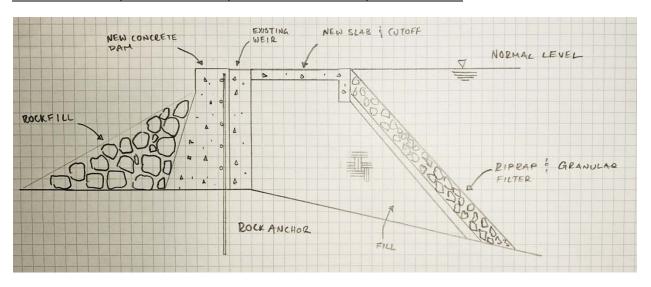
Typical section of proposed concrete structural upgrades (not to scale)
